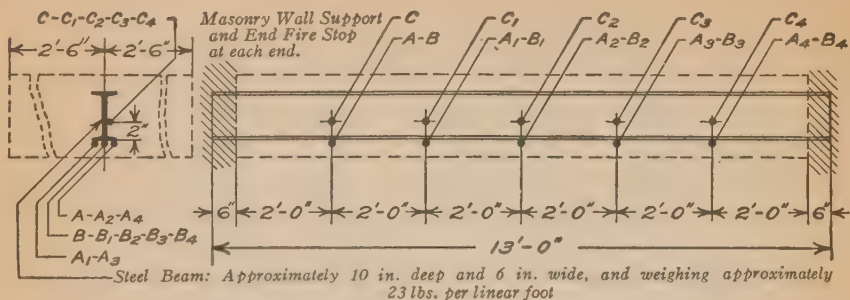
Beam Fireproofing Test for Flush Ceiling
